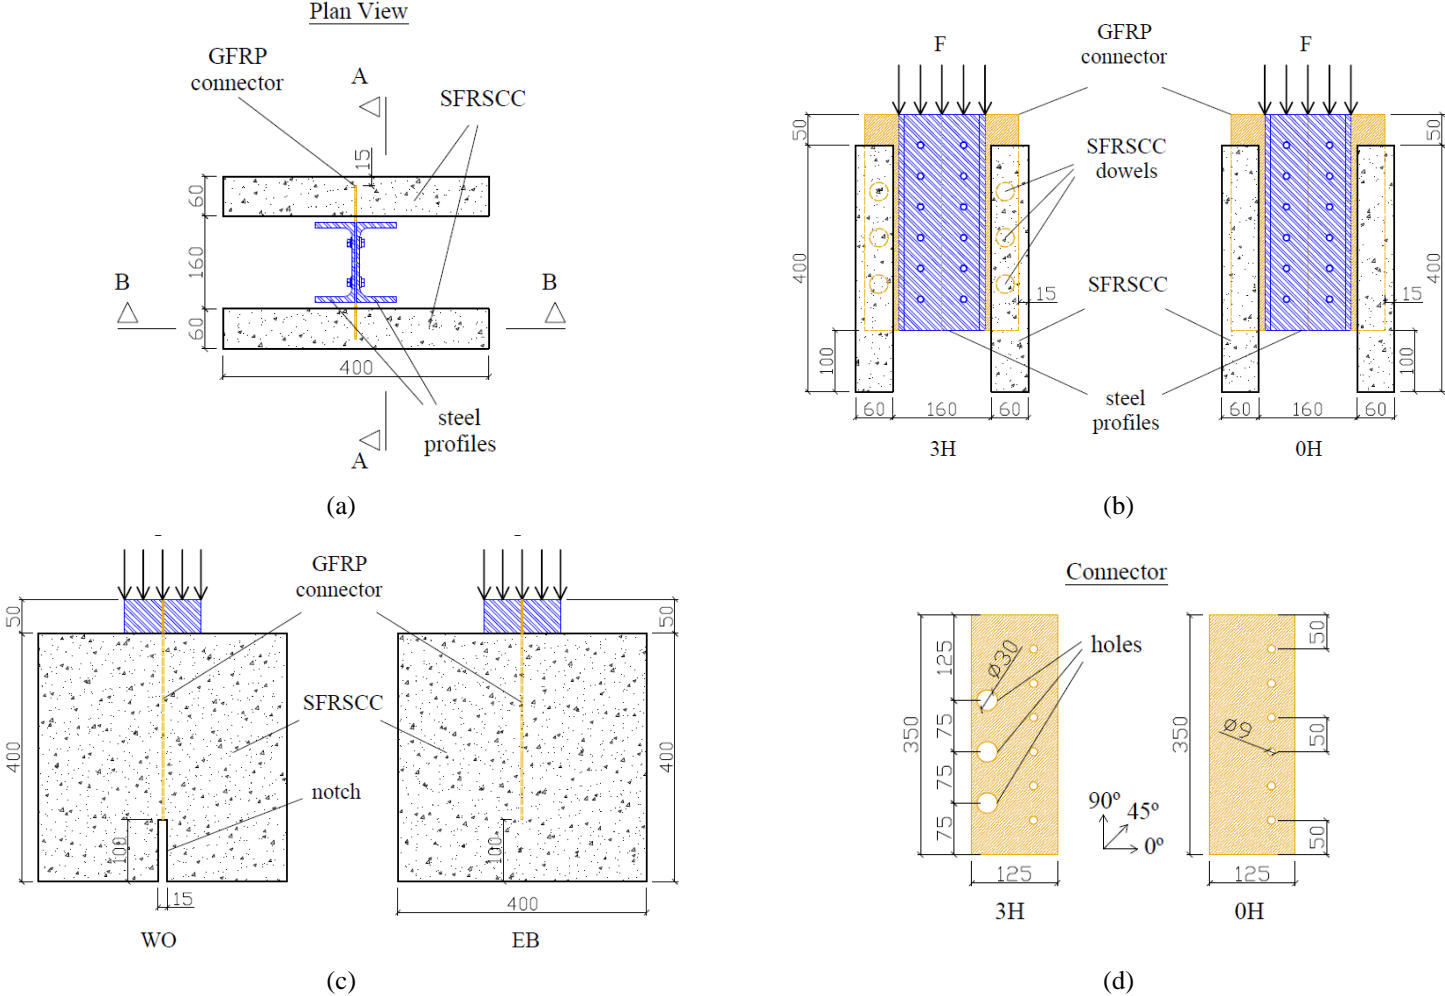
Layout of specimens used in push-out tests: (a) plan view; (b) section AA - 3H and 0H specimens; (c) section BB in WO and EB specimens; (d) lateral view of GFRP connectors used in 3H and 0H specimens (dimensions in millimeter).
